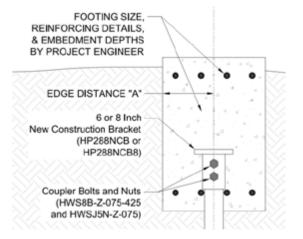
HP288 NEW CONSTRUCTION BRACKET ASSEMBLY
